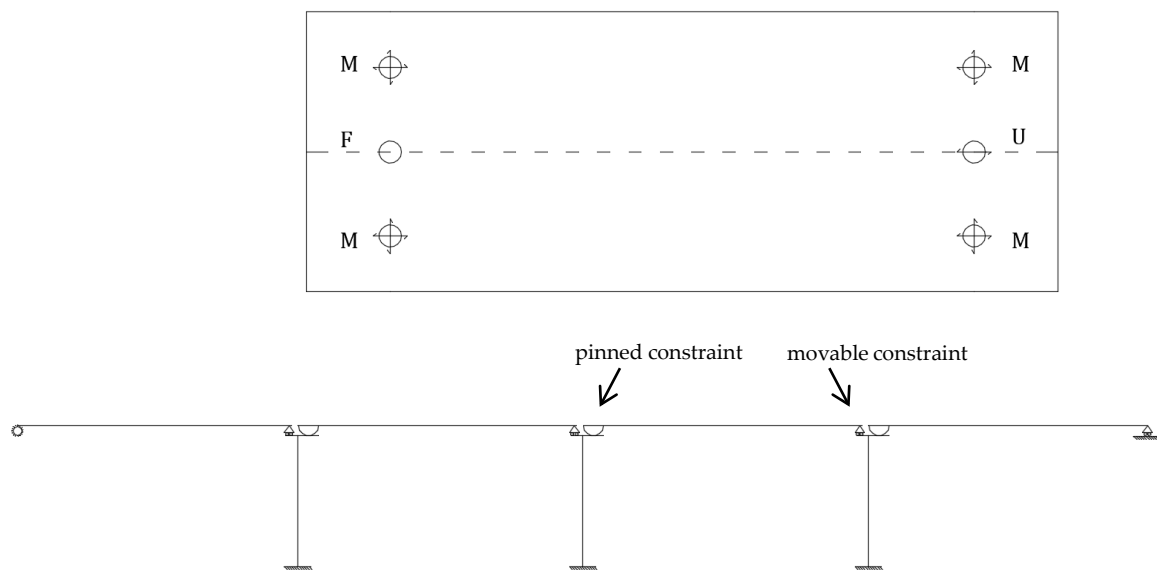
Static scheme for simply supported bridges. M = Multidirectional bearing; U = Unidirectional bearing; F = Fixed bearing.
